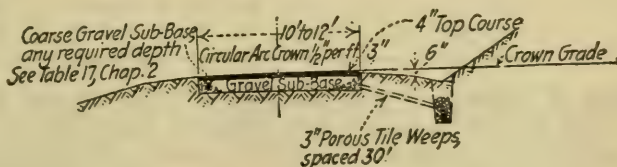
B.—Recommended penetration bituminous macadam pavement section, gravel base construction Class IV traffic.
